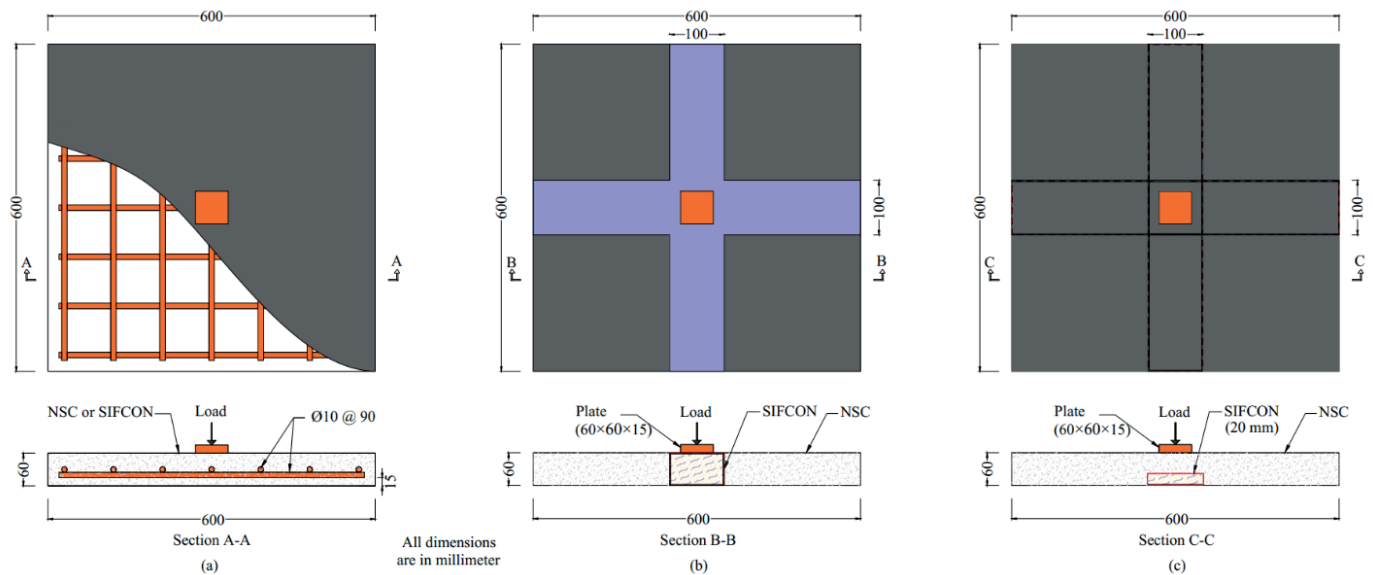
Specimen dimensions and layout: (a) NSC or SIFCON flat slab with reinforcement details; (b) Hybrid flat slab with full depth of SIFCON; (c) Hybrid flat slab with partial depth of SIFCON
